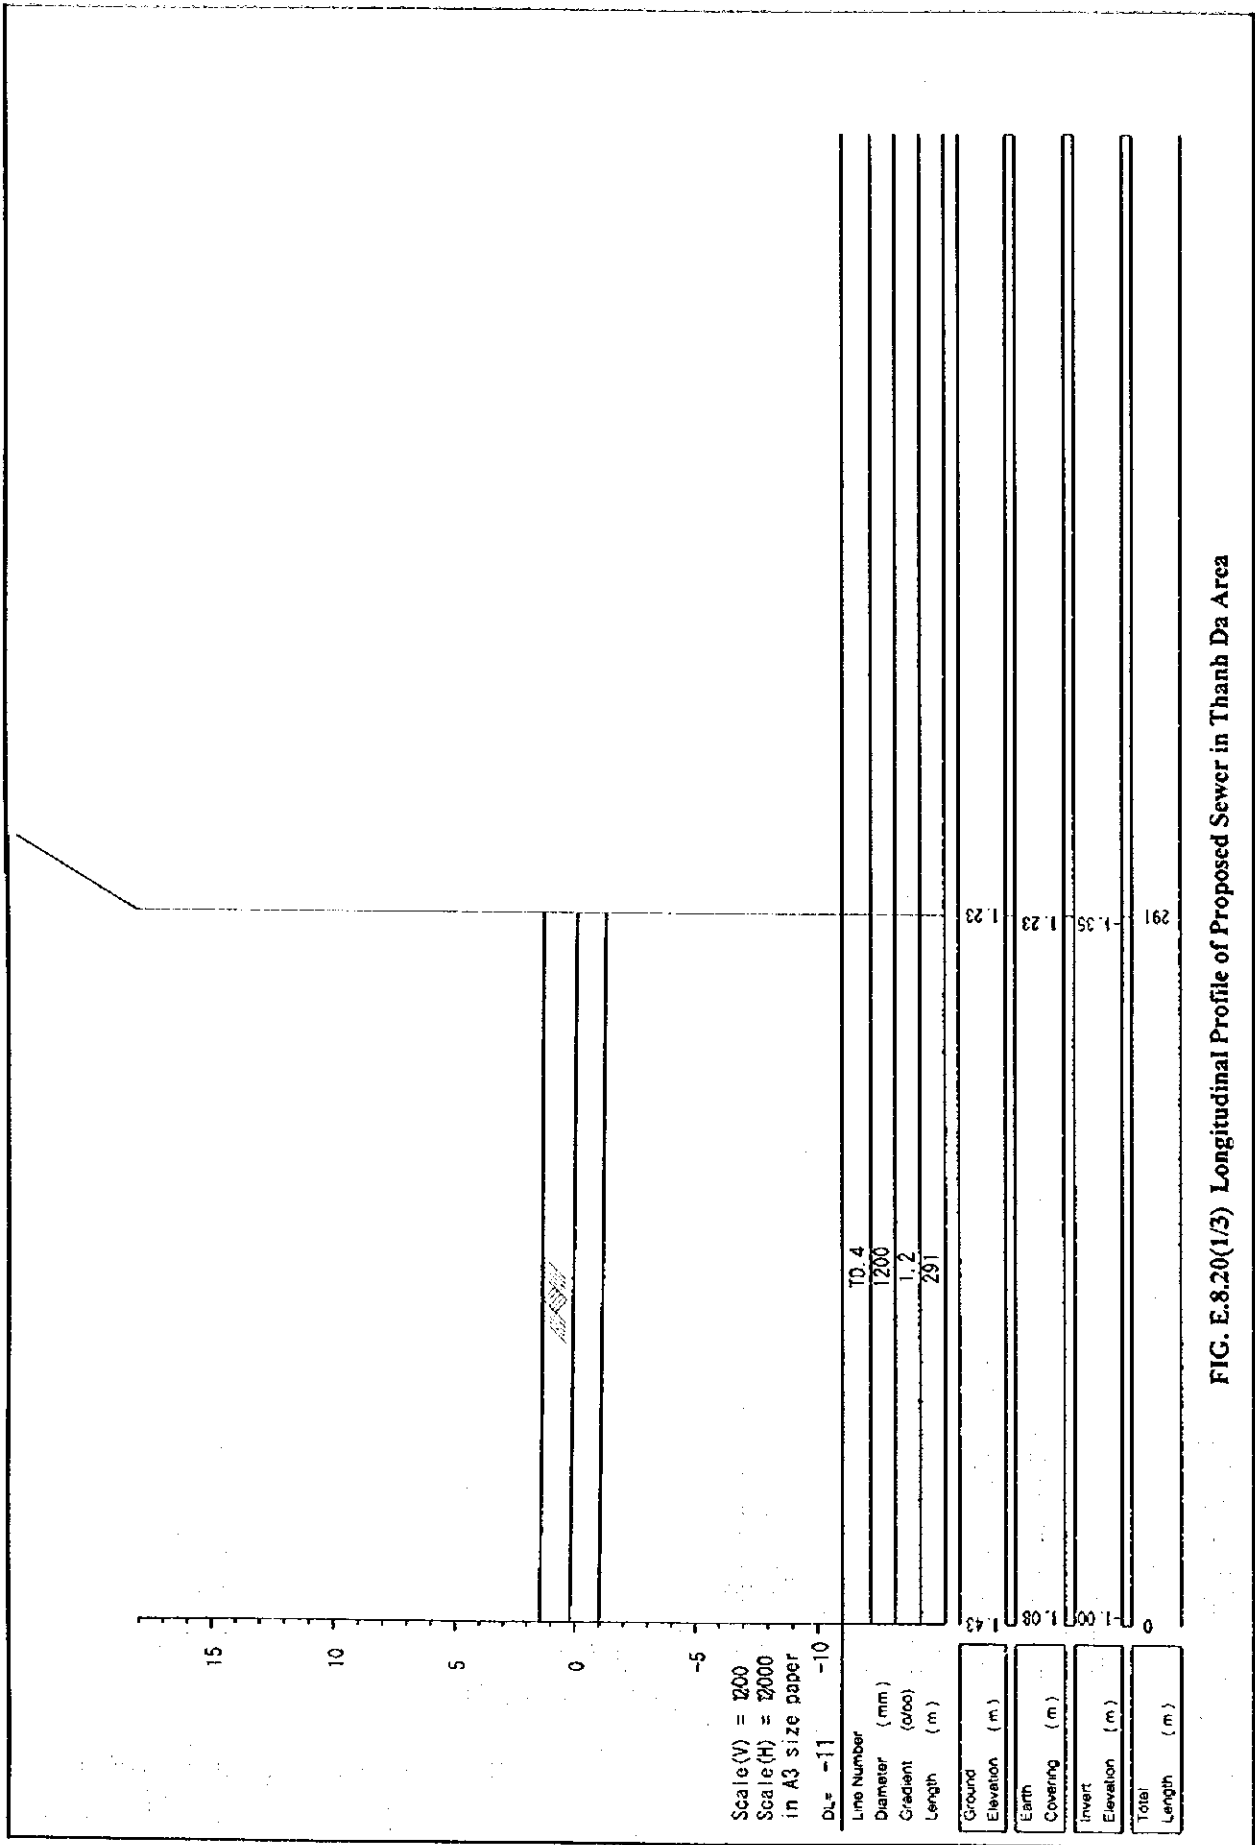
(1/3) Longitudinal Profile of Proposed Sewer in Thanh Da Area
